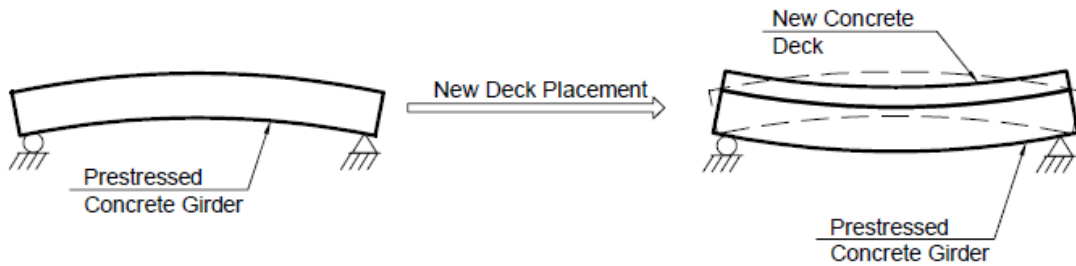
New Deck Placement on the Girder after Deck Removal
